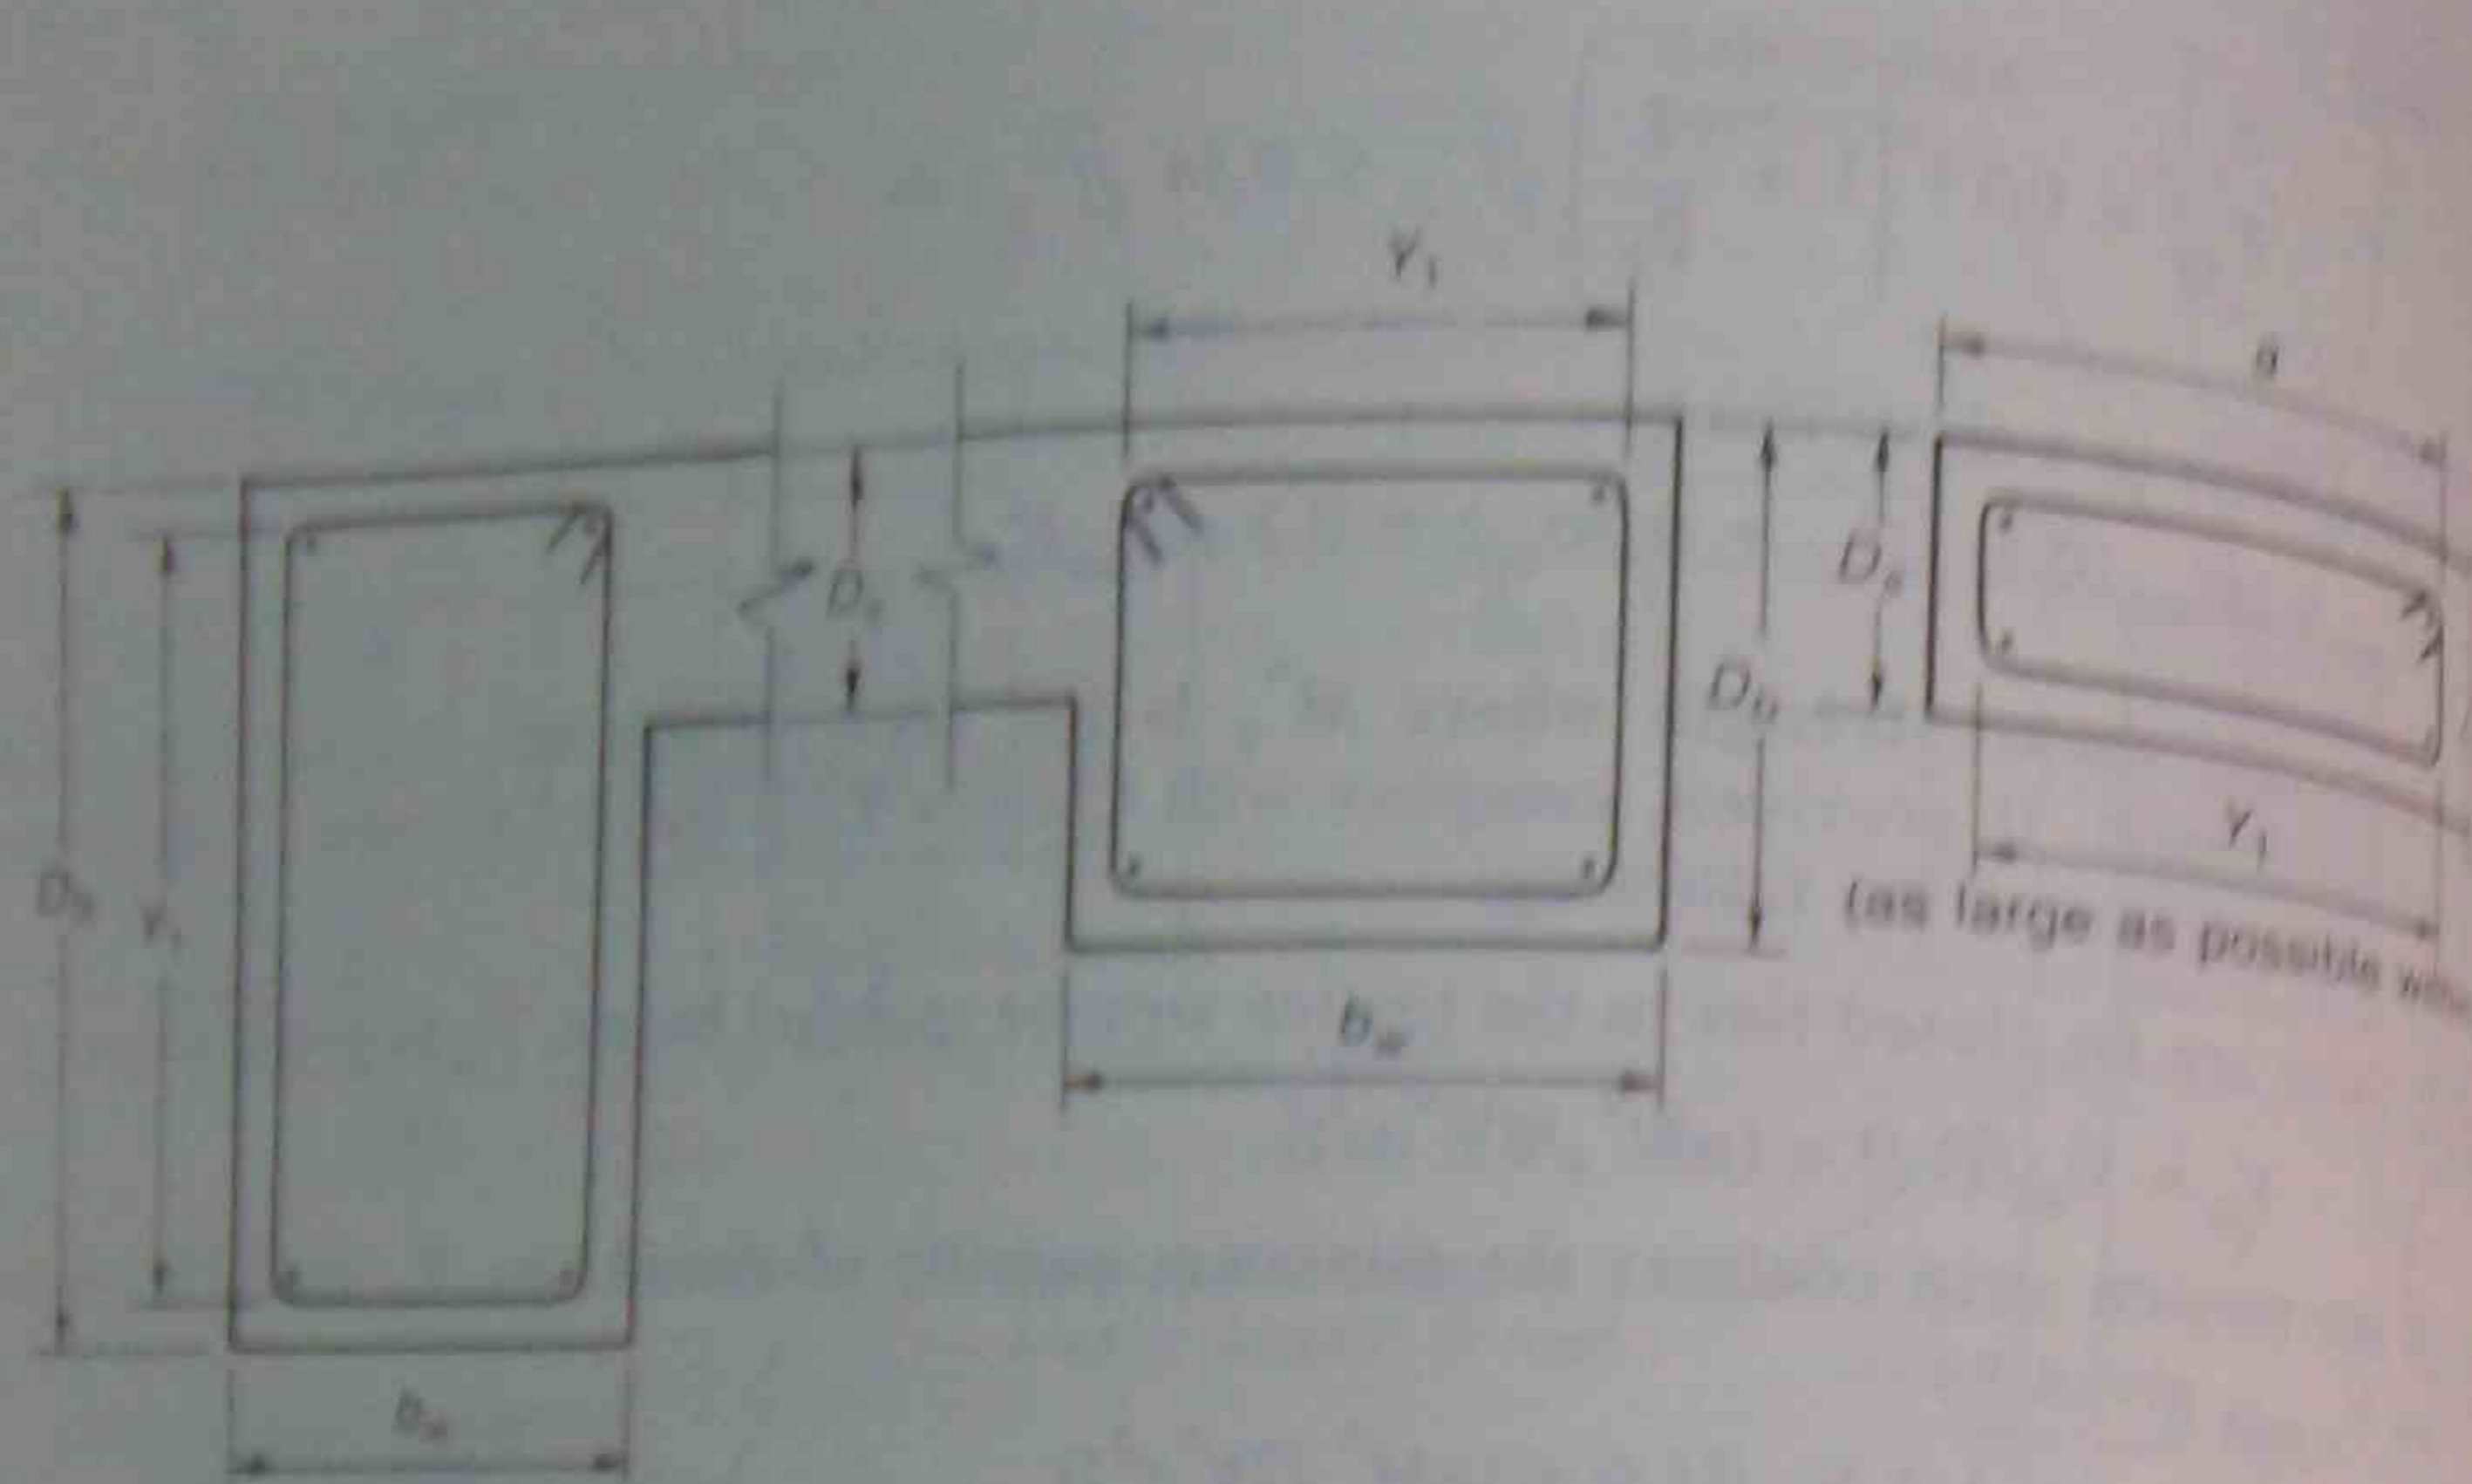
PARAMETERS AND DETAILS OF SHEAR REINFORCEMENT FOR SLABS
